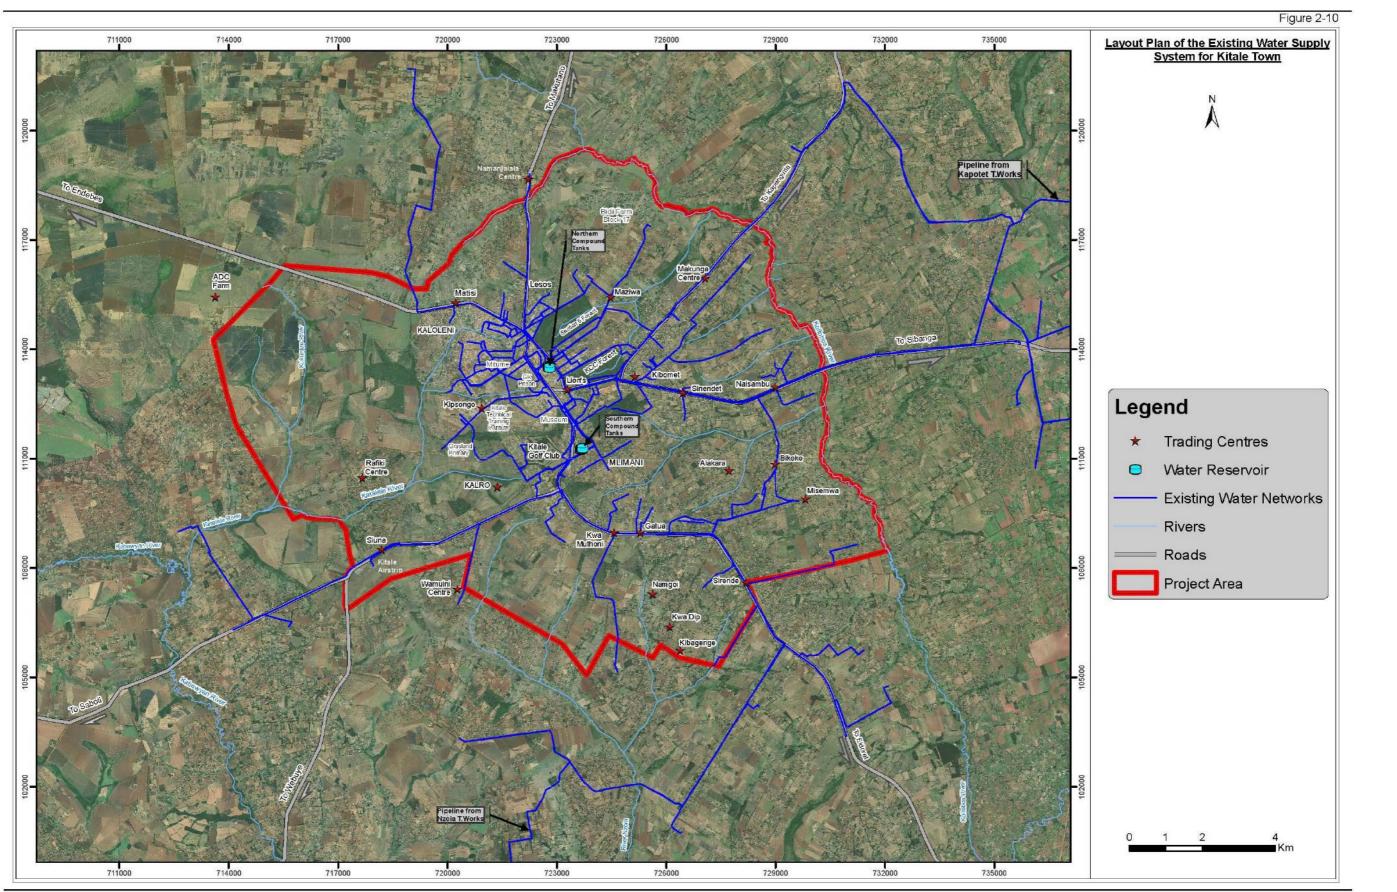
A Layout Plan of the existing Water Supply System for Kitale Town
